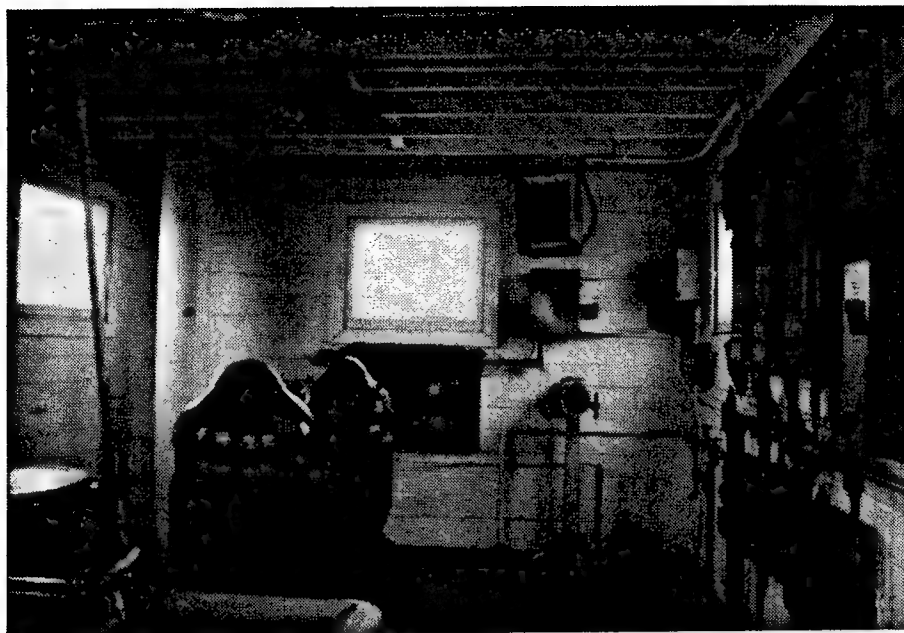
Building 93B: Interior of Industrial Waste Pump House showing Vertical Turbine Pumps.
